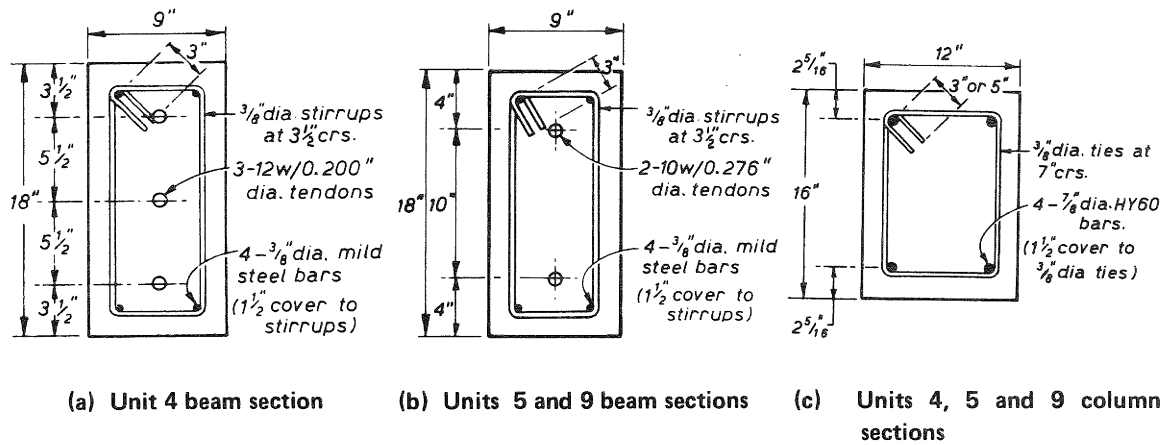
SECTIONS OF MEMBERS OF UNITS 4,5 AND 9
